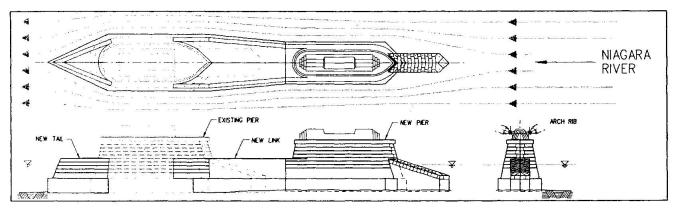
Typical River Pier, Including Link to Existing Pier and New Tail on Existing Pier
